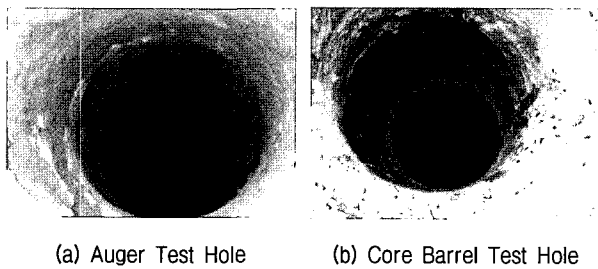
Photos of boreholes excavated by auger and core barrel at TS site
